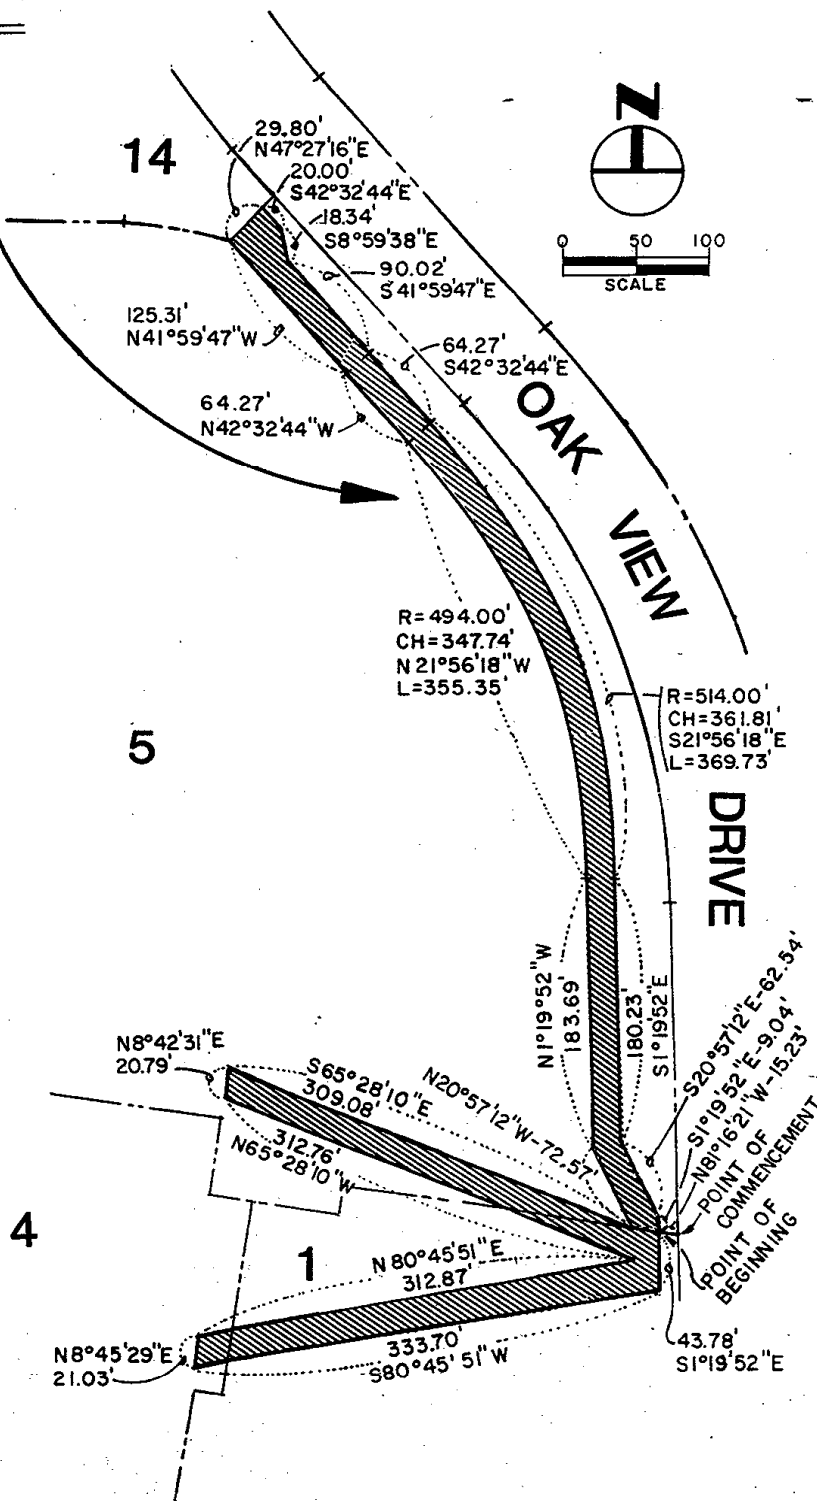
/2	DATE 5-1-92	TITLE POWER LINE EASEMENT	 <b>KIRKHAM, MICHAEL AND ASSOCIATES</b> ARCHITECTS ENGINEERS PLANNERS
